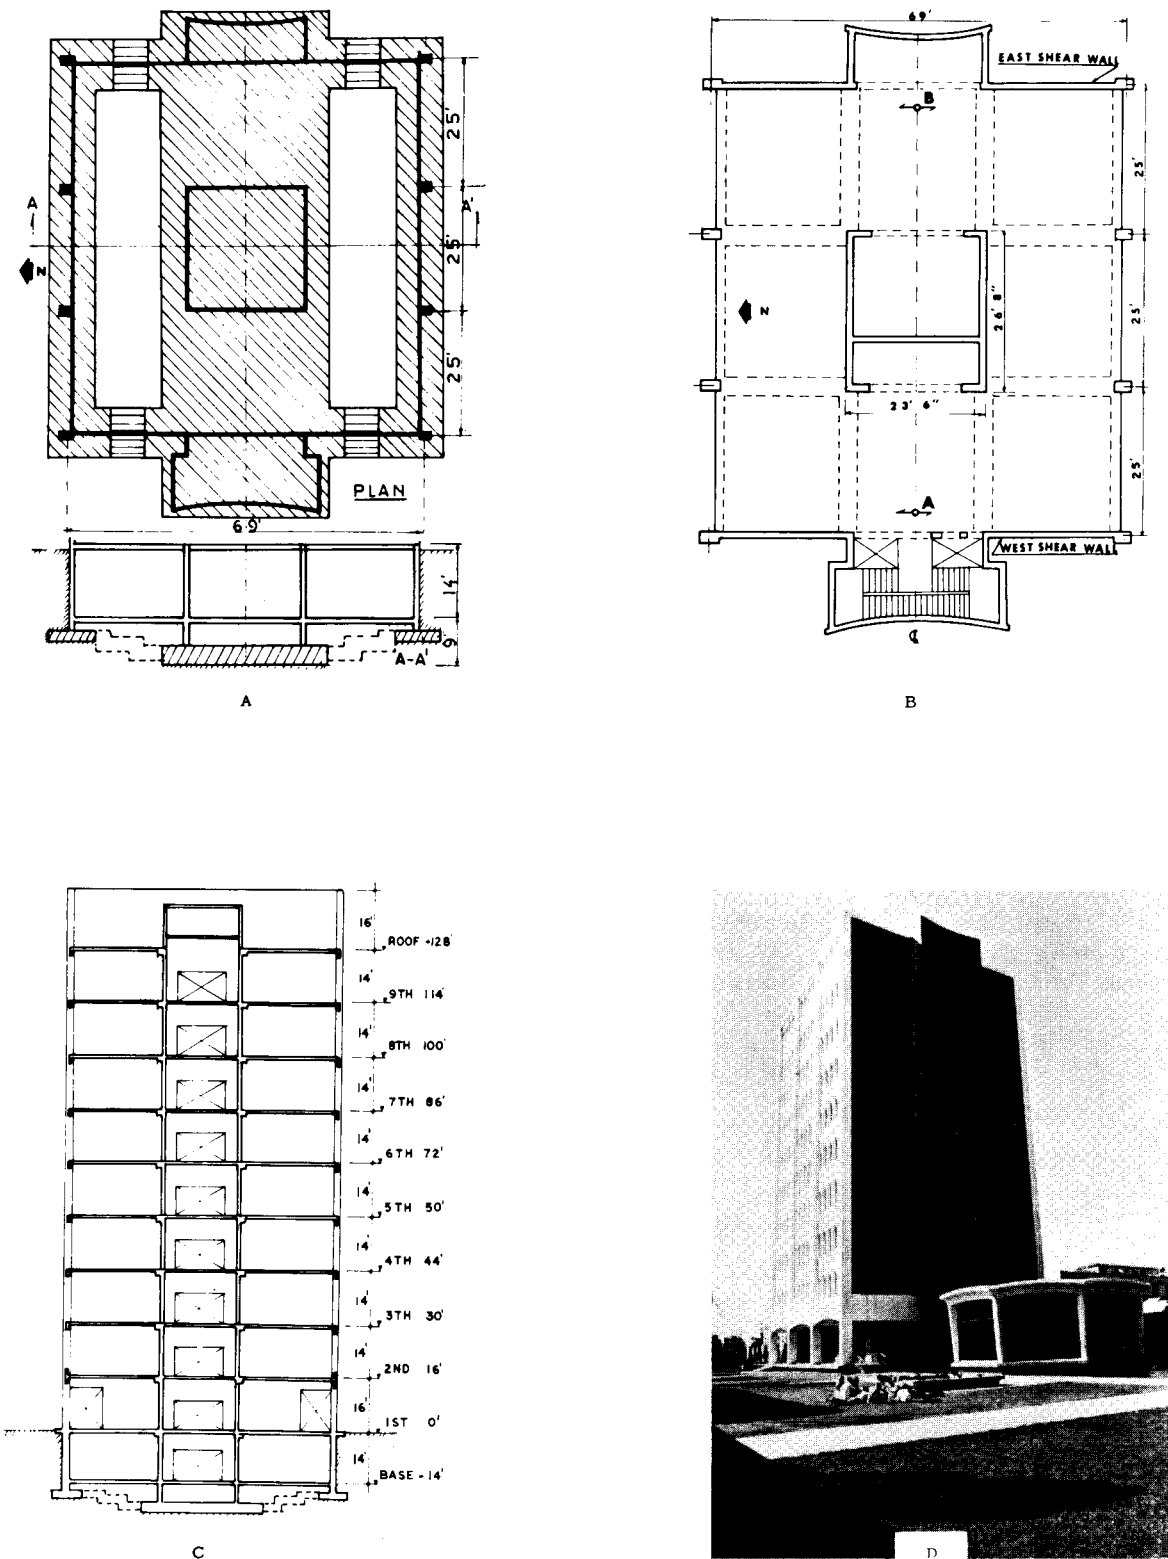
Millikan Library Building: (a) Foundation plan and N-S Section; (b) Typical Floor Plan; (c) a N-S Section; (d) View of Building Looking Northwest.
